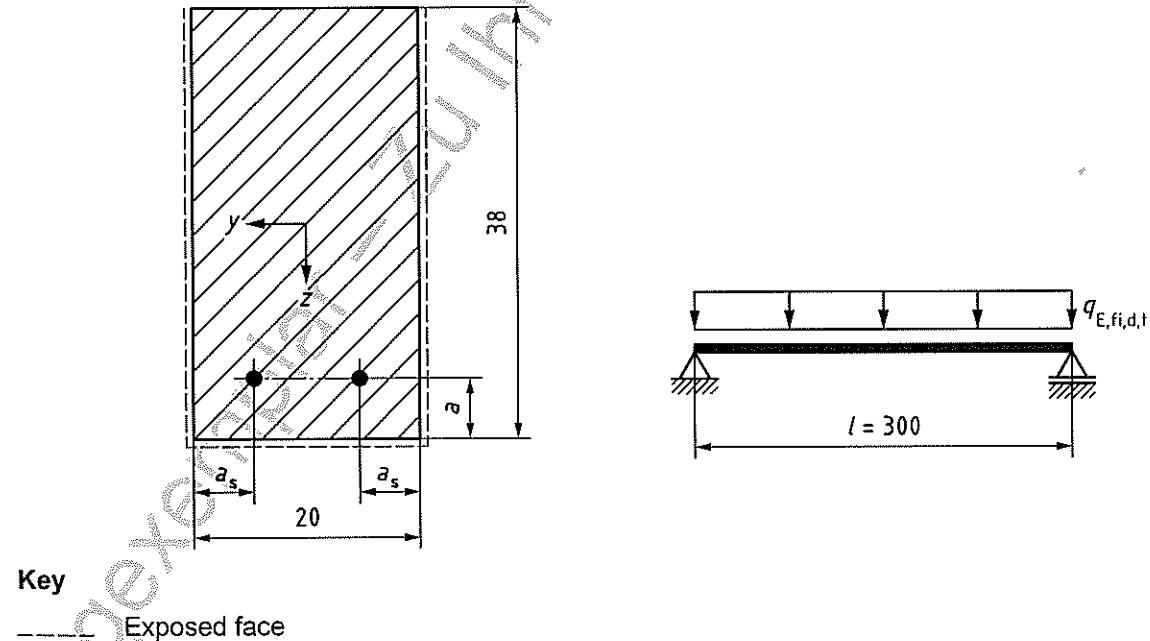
Lightly reinforced concrete flexural beam — cross section and system
